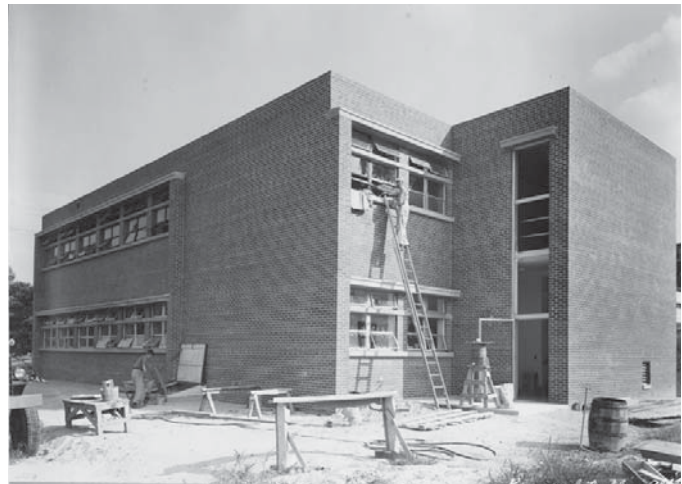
Calculator Building (“Research Building Addition”) looking Southwest, Oct. 1 1947. Courtesy of Georgia Tech archives.
